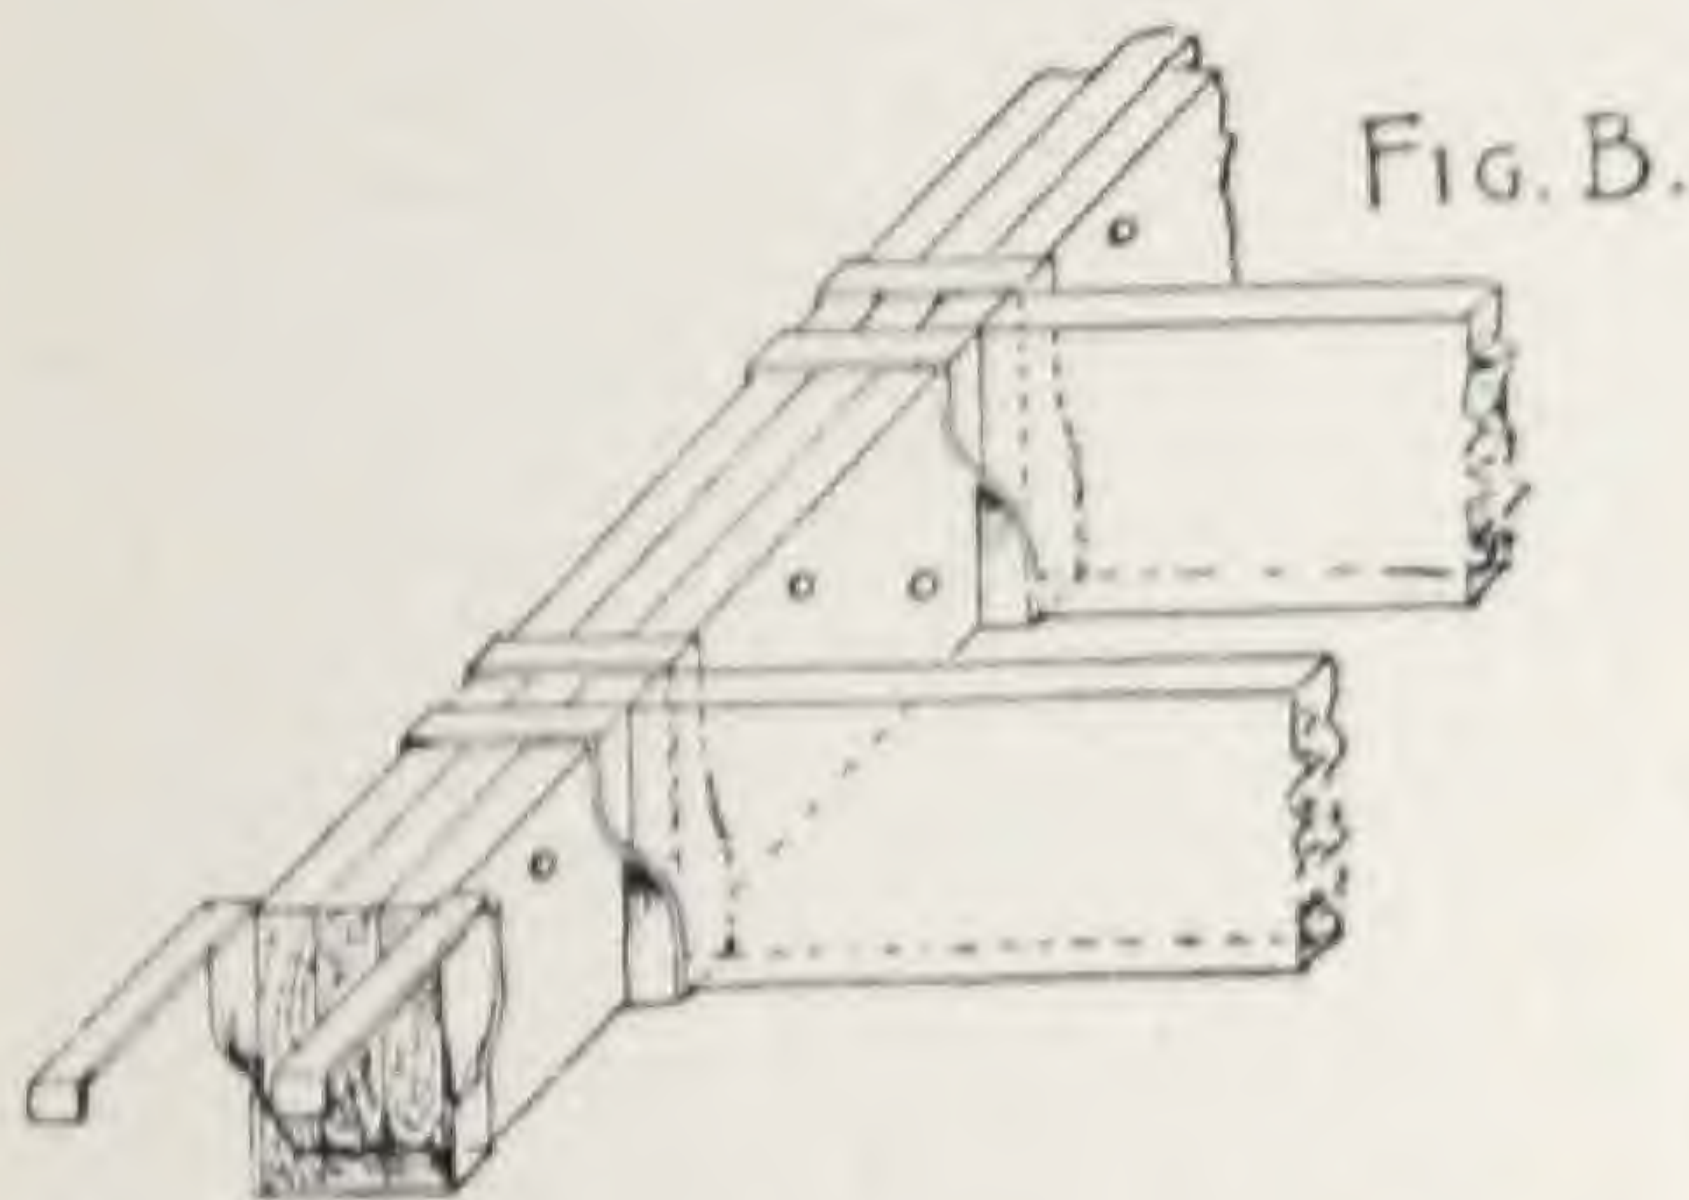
Fig. B shows the method of framing with wrought iron stirrup and steel Hangers. The shrinkage of the timbers allows the joists to drop below the beam, and thereby cracking the ceiling and lowering the floor on either side of the beam. Numerous instances have occurred where floors had to be raised so as to make them level.
